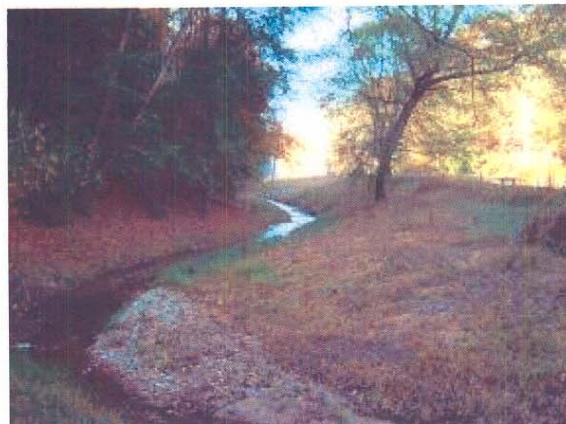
Looking downstream from as-built Station ~38+00.
